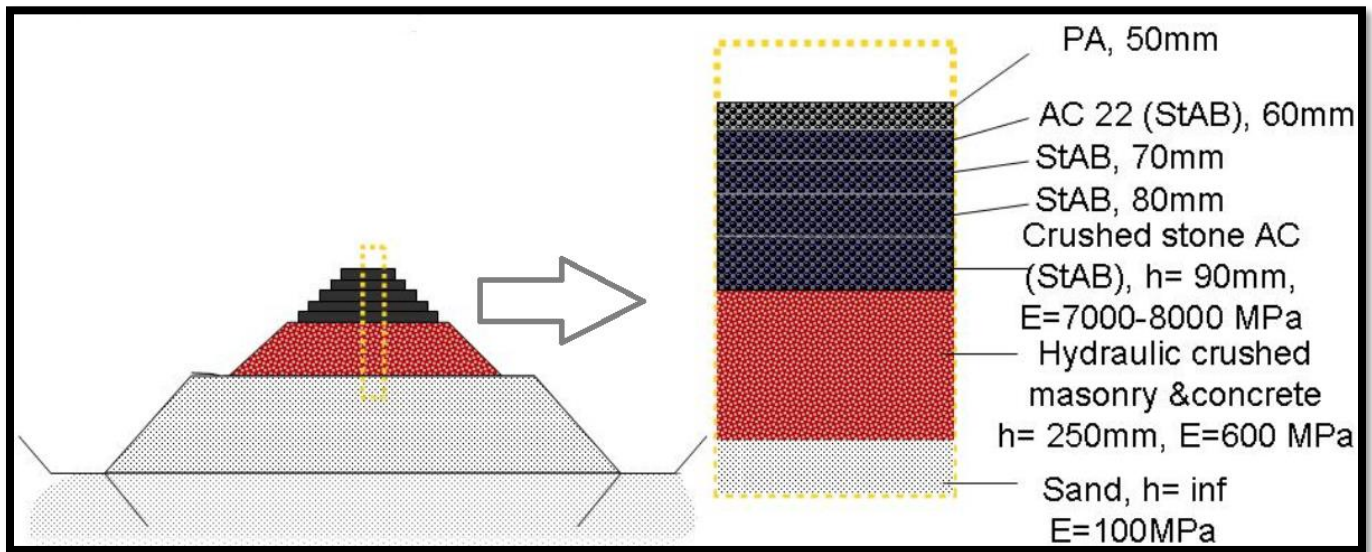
Typical cross-section example of Dutch asphalt pavement
